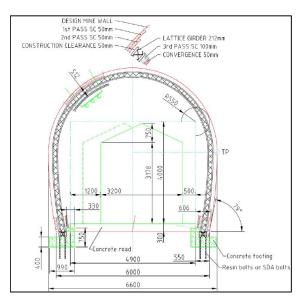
Cross-section of Horseshoe profile showing tolerances and clearances
